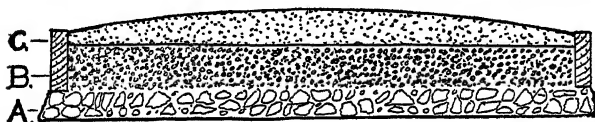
Structure of a concrete walk. a, foundation; b, coarse concrete; c, finish coat of fine concrete.
